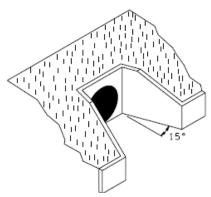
Headwall with Wingwalls for Circular Pipe
